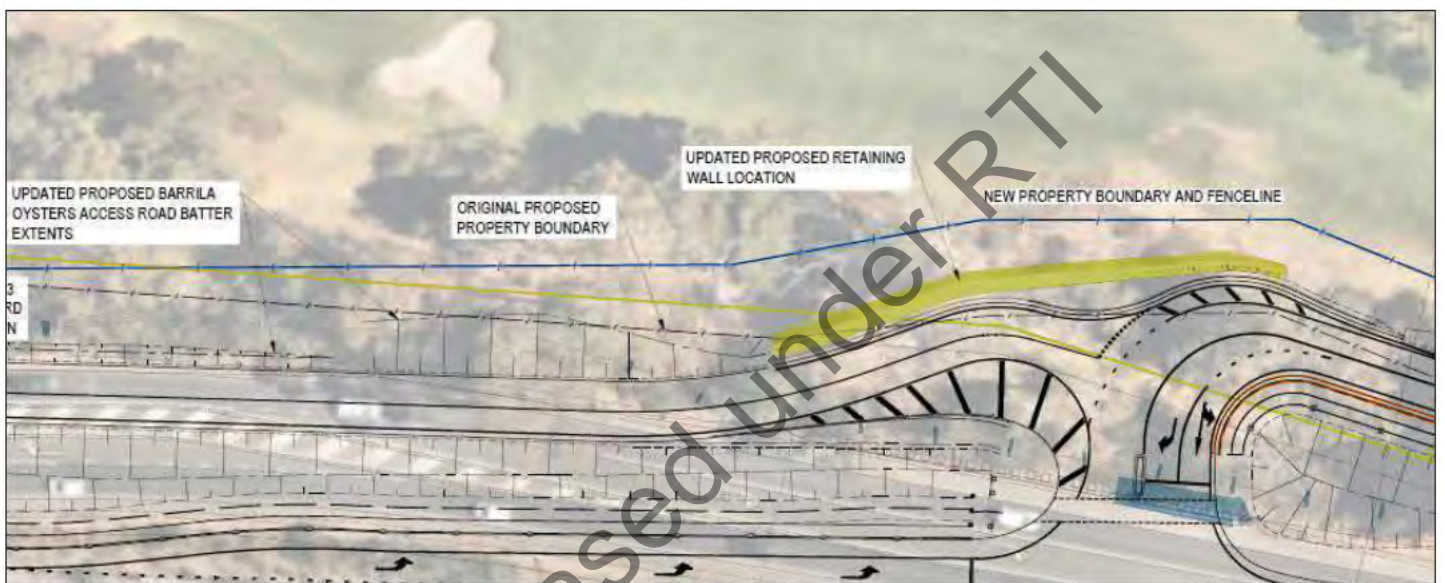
Detail of road design plans showing gap between edge of earthworks and new property boundary fence
